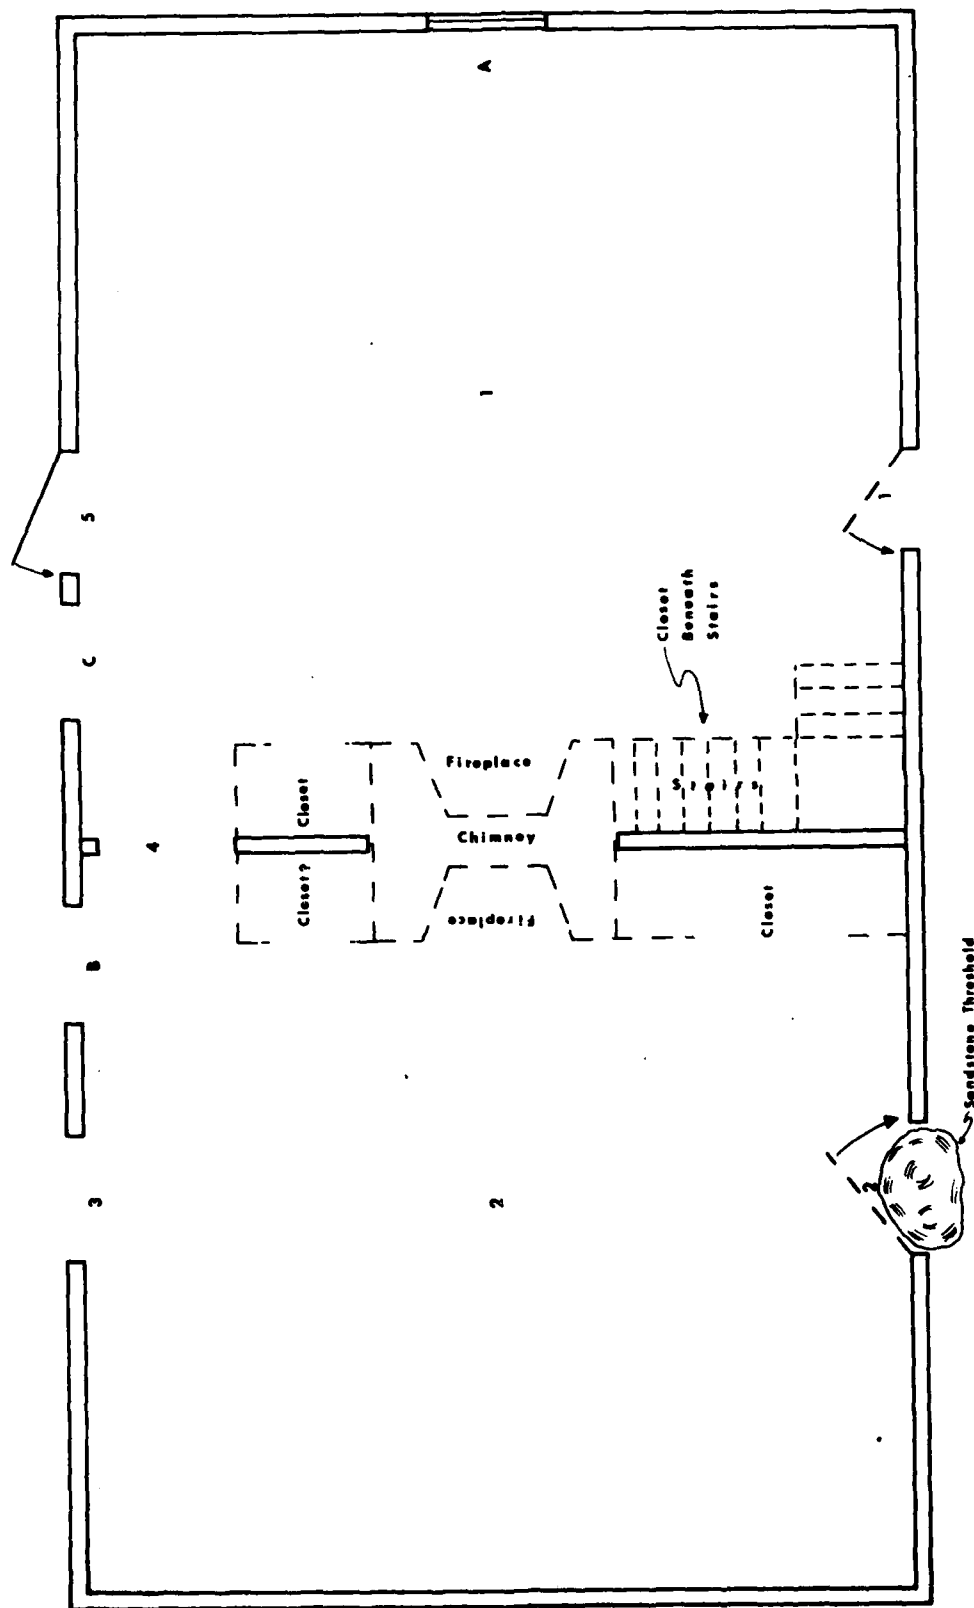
Floor plan of the Jesse Williams log dwelling/barn on Tract 602. Note that the central chimney and all flooring was removed ca. 1947 when the dwelling was converted to use as a tobacco curing barn. All areas in dashed lines are conjectural in scale but their locations are based on information supplied by Jesse Williams (1980, pers. comm.).
